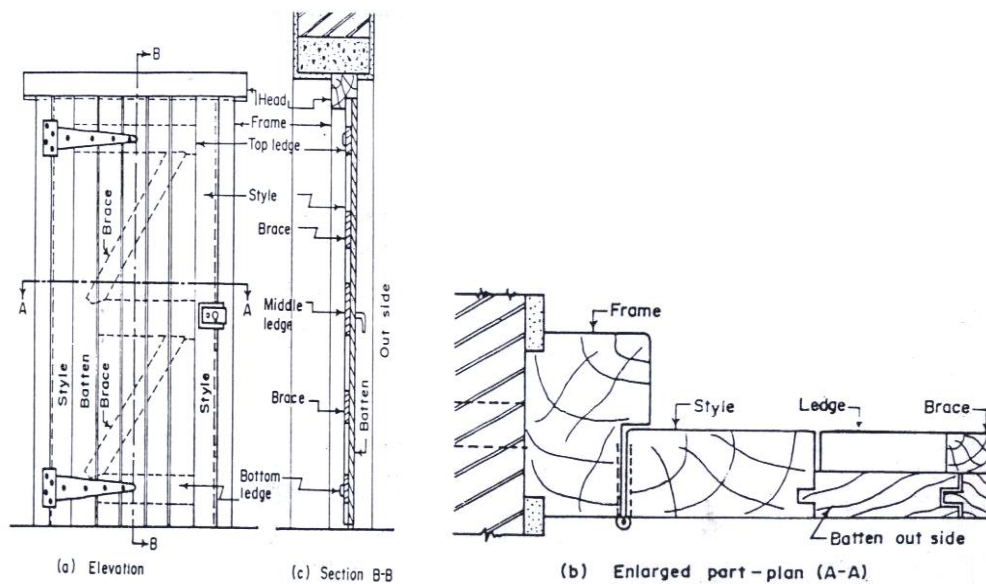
Battened, ledged, braced and frame doors
